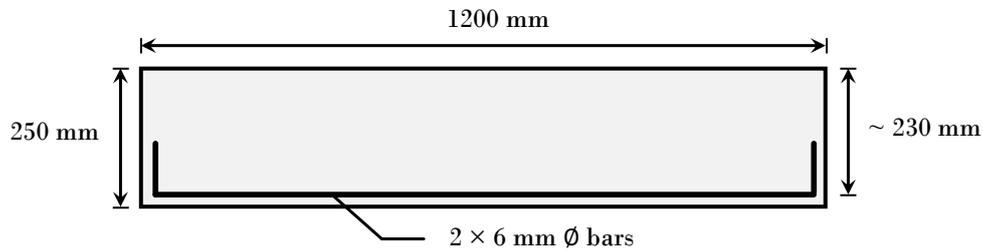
Dimensions and reinforcement layout of rammed earth beams
